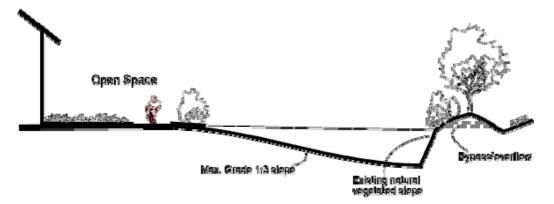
Figure Exception to 20.50.160(A)(2) and (3): Example of stormwater facility design which does not require fencing.
